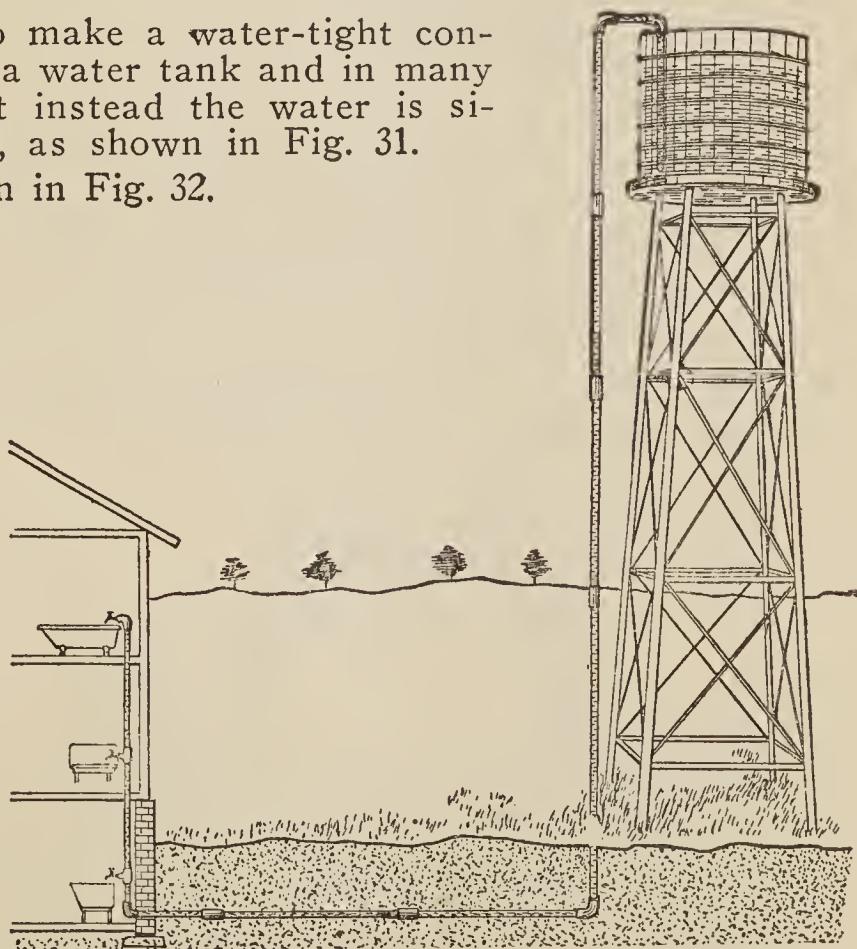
The Arrangement of Piping Used to Siphon Water Over the Top of a Storage Tank.
